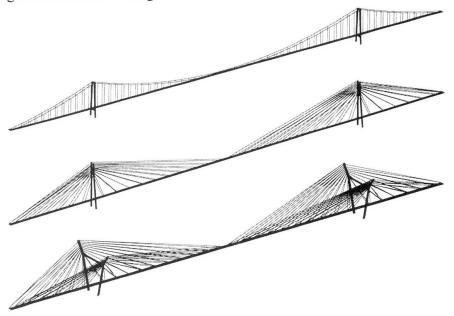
Illustrations of the three cable-supported bridges studied. Upper: suspension bridge, middle: plane (or traditional) cable-stayed bridge, lower: spatial cable-stayed bridge.
